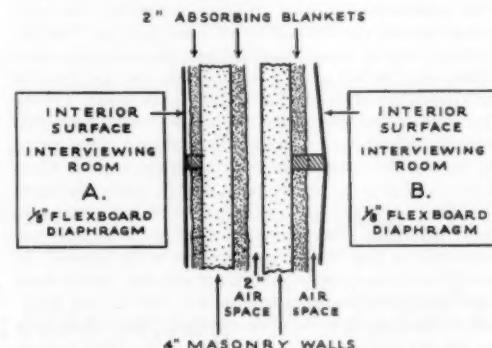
Diagrammatic sketch of double-wall construction at point X in Fig. 1 (horizontal plane).
